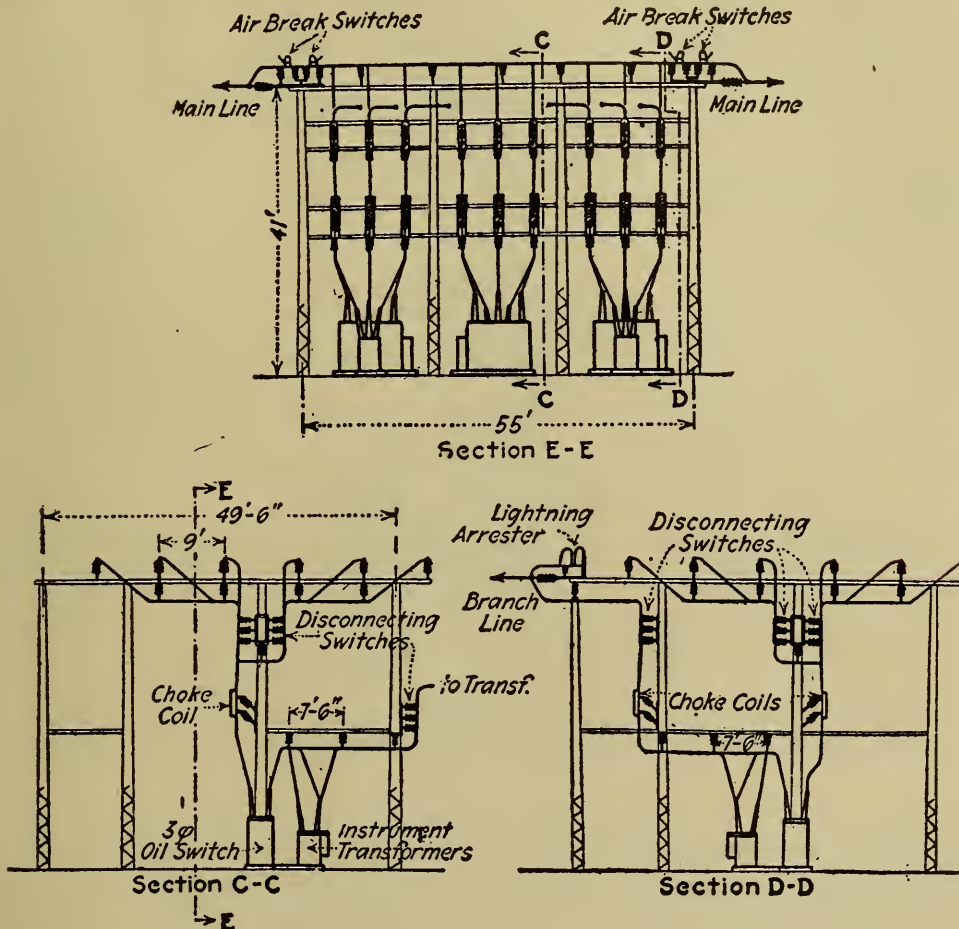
OUTDOOR STATION EQUIPPED WITH OIL CIRCUIT BREAKERS AND METERING EQUIPMENT (SEE FIG. 89)
